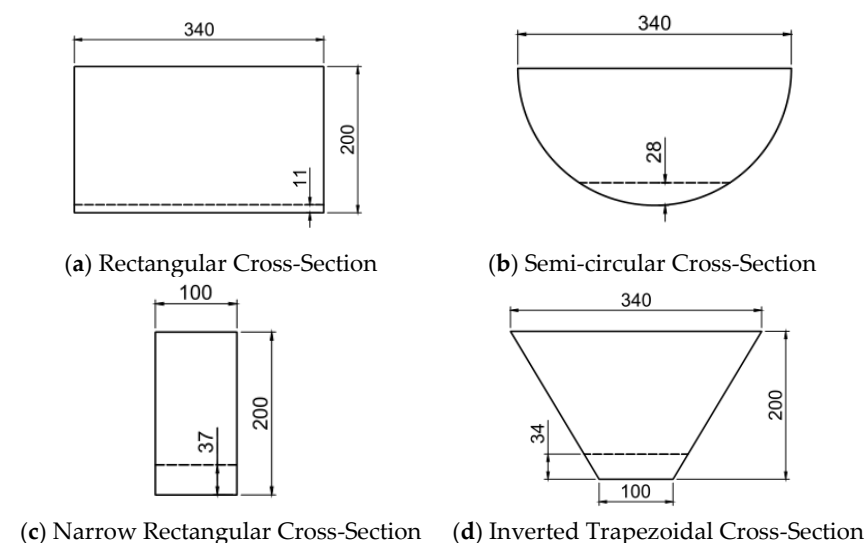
Cross-Section Configurations of Drainage Trenches (Unit: mm).
